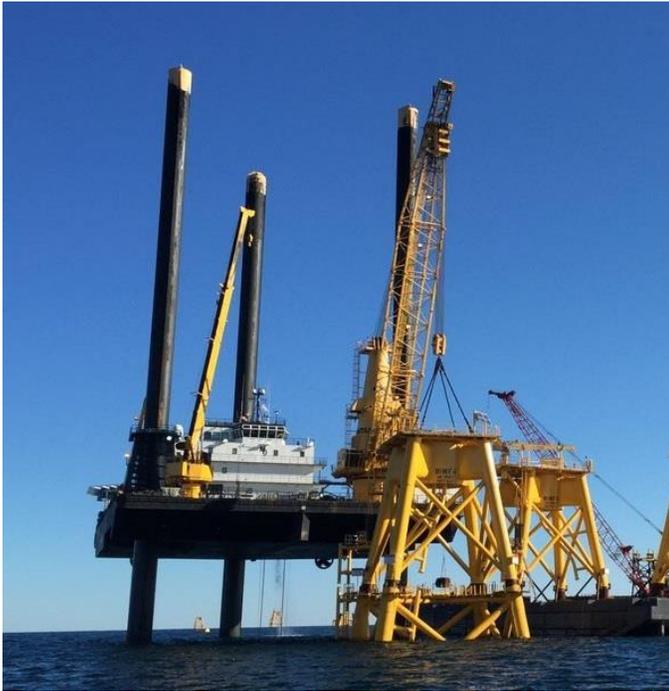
LIFTBOAT LB ROBERT INSTALLING A WTG FOUNDATION JACKET AT BIWF (PHOTO MONTCO OFFSHORE)
